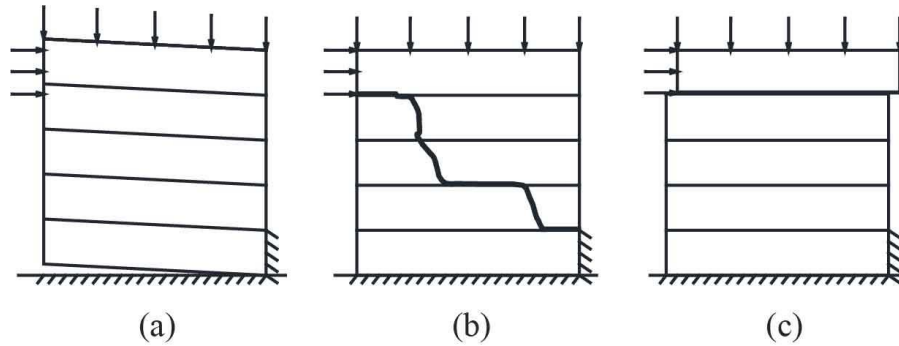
Typical failure mode of RE wallettes observed under shear loading.
